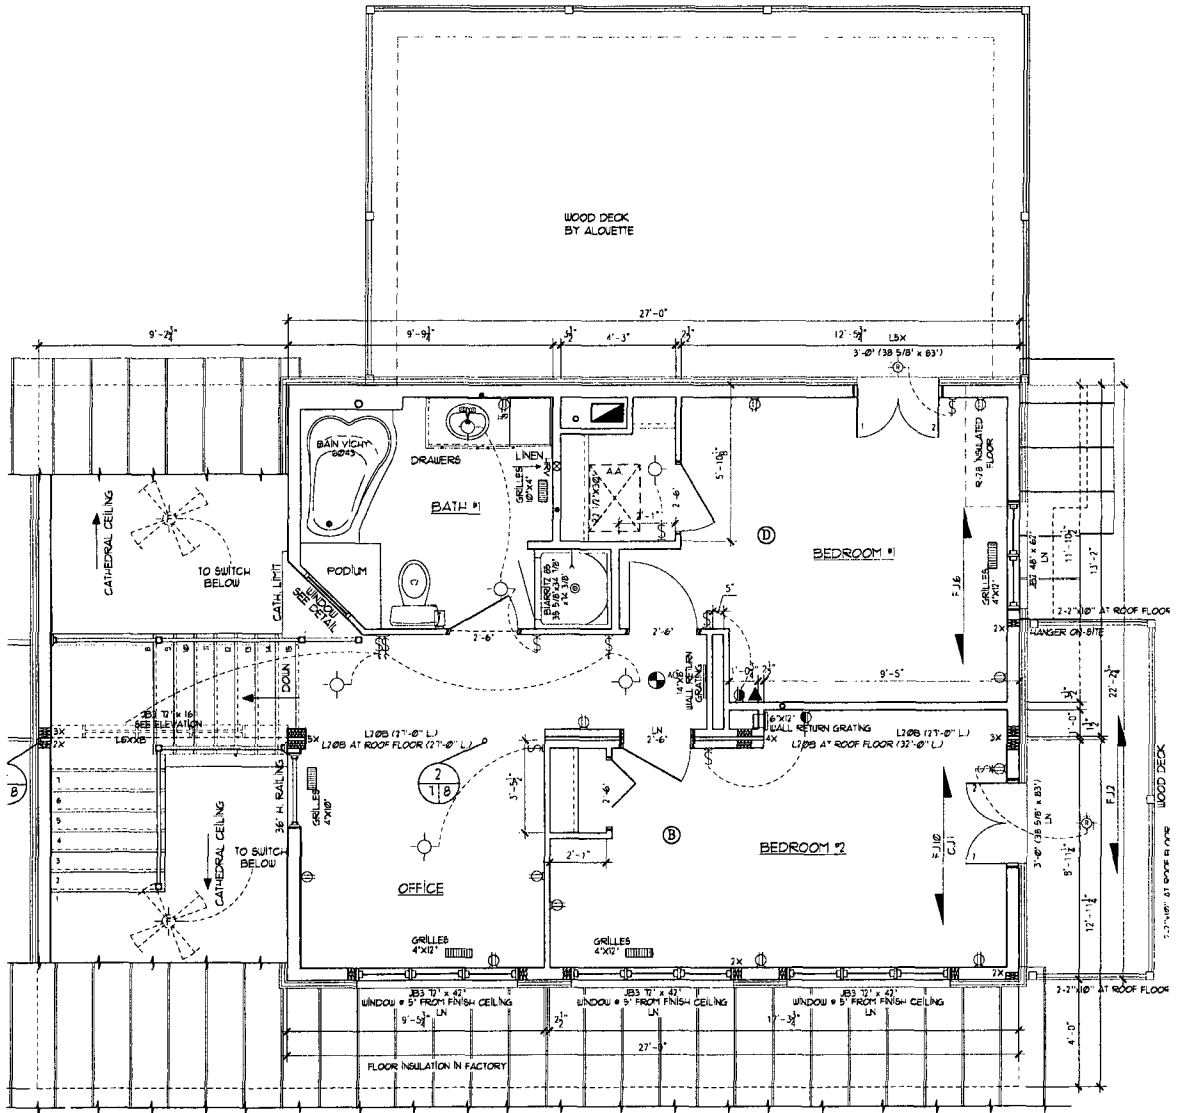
1st floor plan (courtesy of Alouette Homes)
